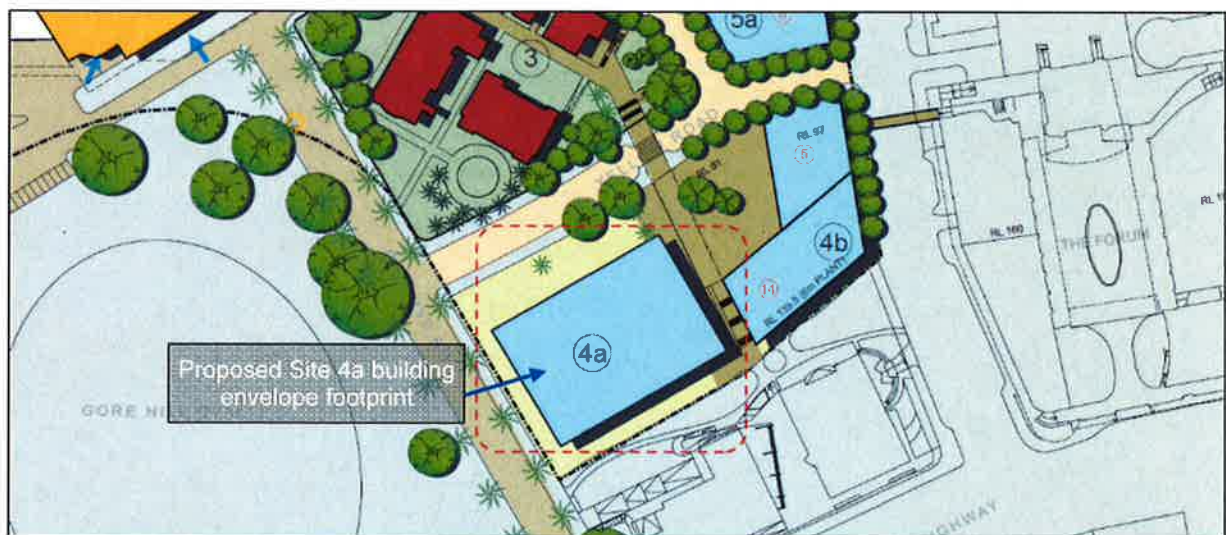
Proposed Precinct 4 Concept Plan Layout (source: Modification Application MP 06_0051 MOD 7)
